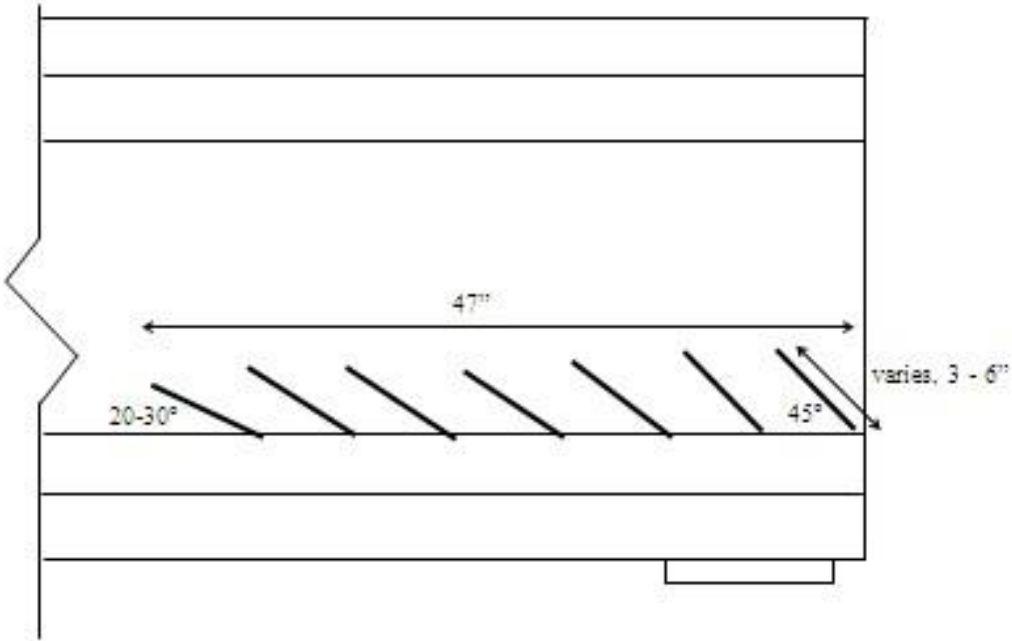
Crack diagram, exterior girder, west side, west face, south abutment (#9728).
